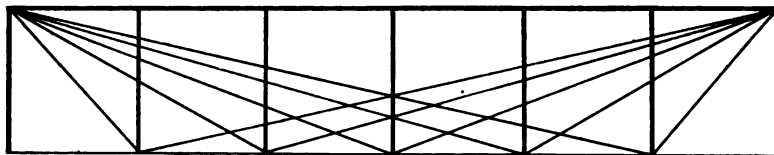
BOLLMAN TRUSS DIAGRAM.
